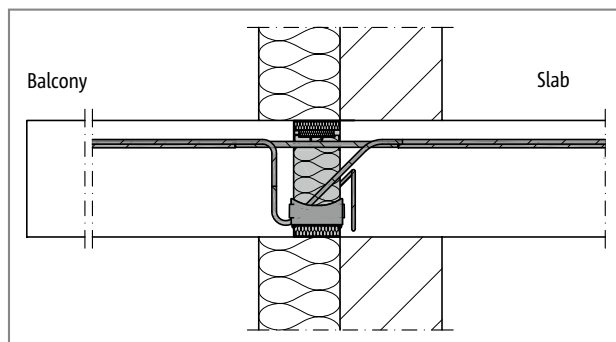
Schöck Isokorb® T type K-E, K-T: Connection for a thermal insulation bonded system WDVS
